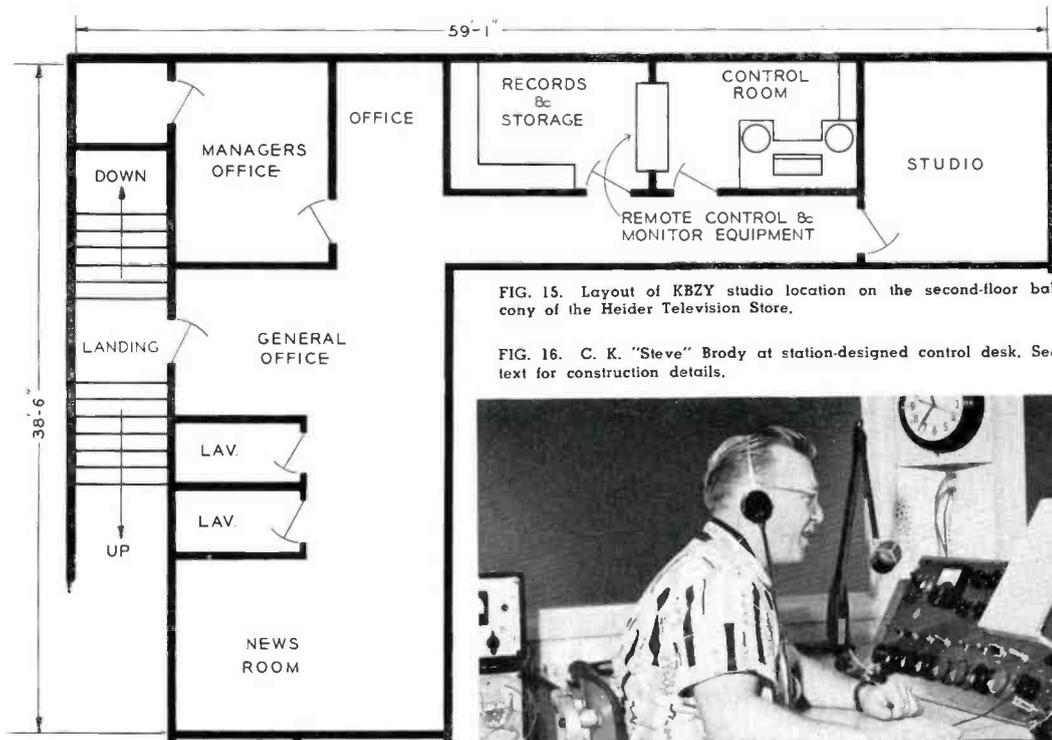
Layout of KBZY studio location on the second-floor balcony of the Heider Television Store.
